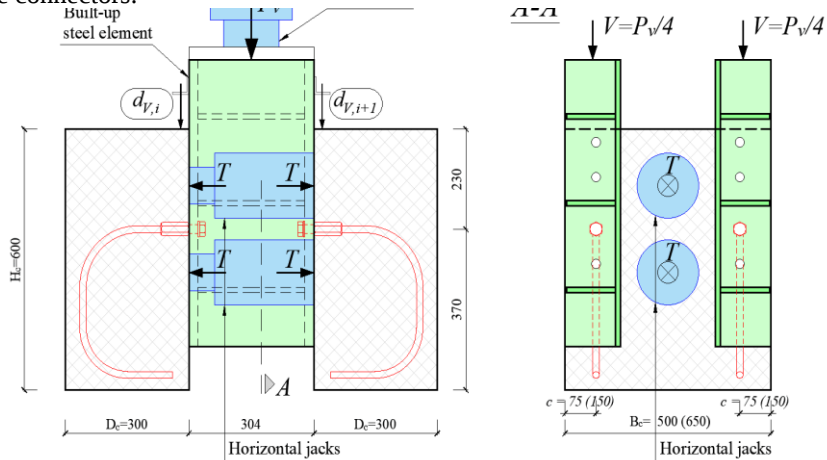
The layout of modified push-out specimens used for testing the connection under pure shear load and combined shear and tension loads
